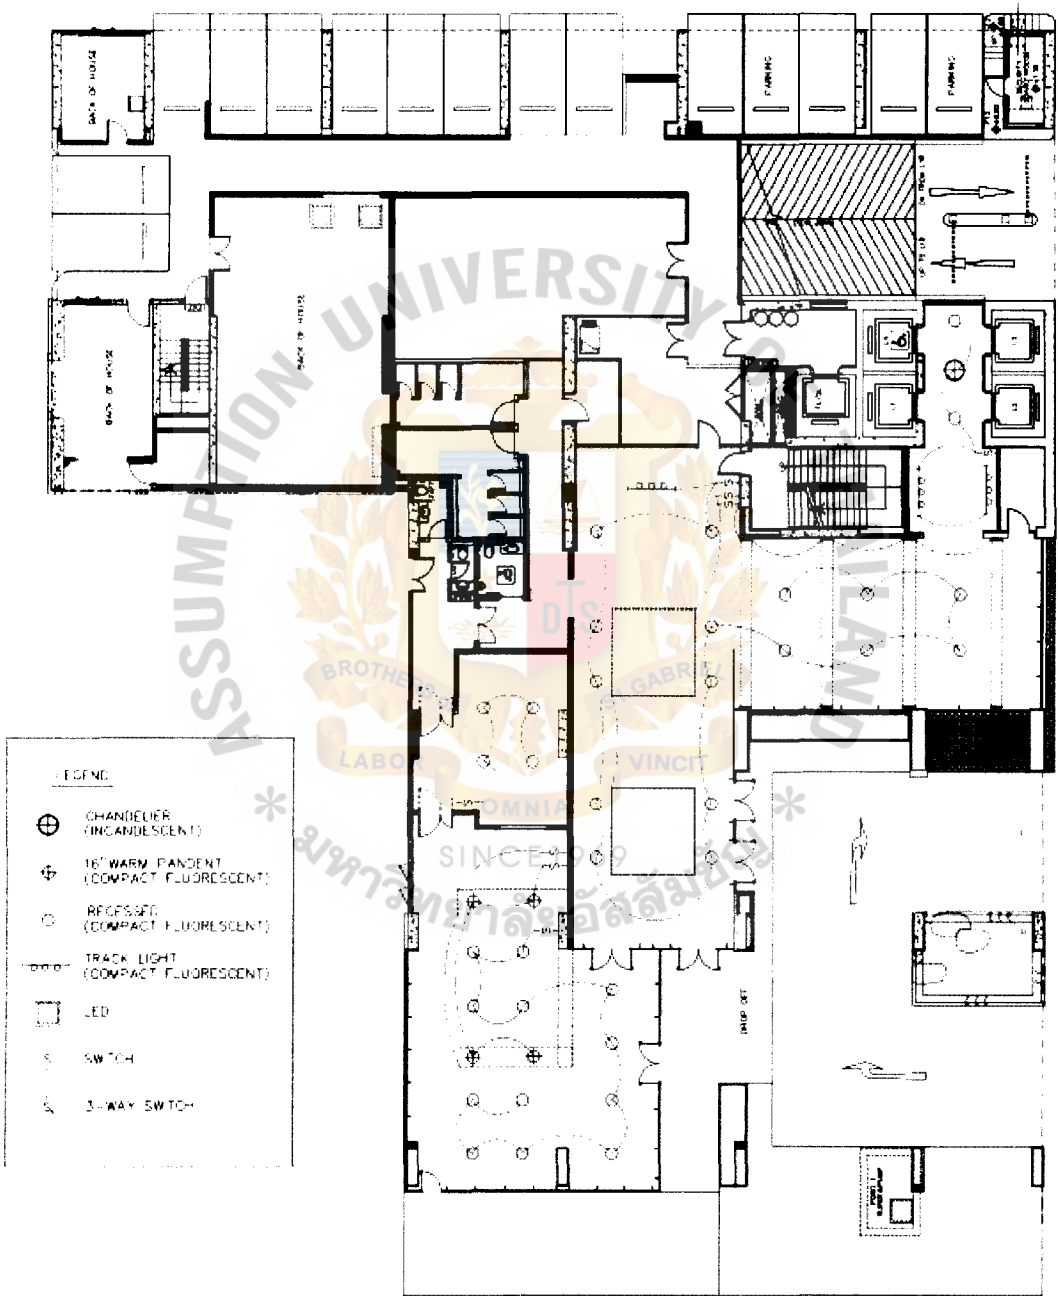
Reflected Ceiling and Lighting Plan of 1st floor plan
